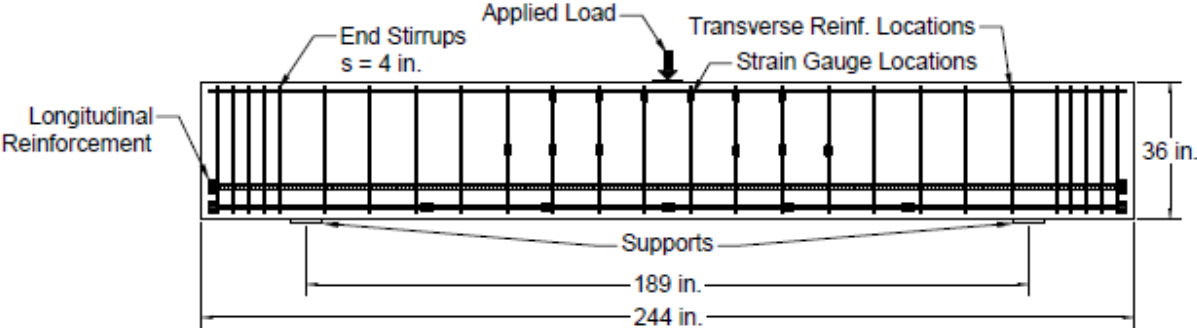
Side view showing reinforcement for specimens from Phase 1 with 12-in. [310-mm] transverse reinforcement spacing and strain gauge locations [1 in. = 25.4 mm]
